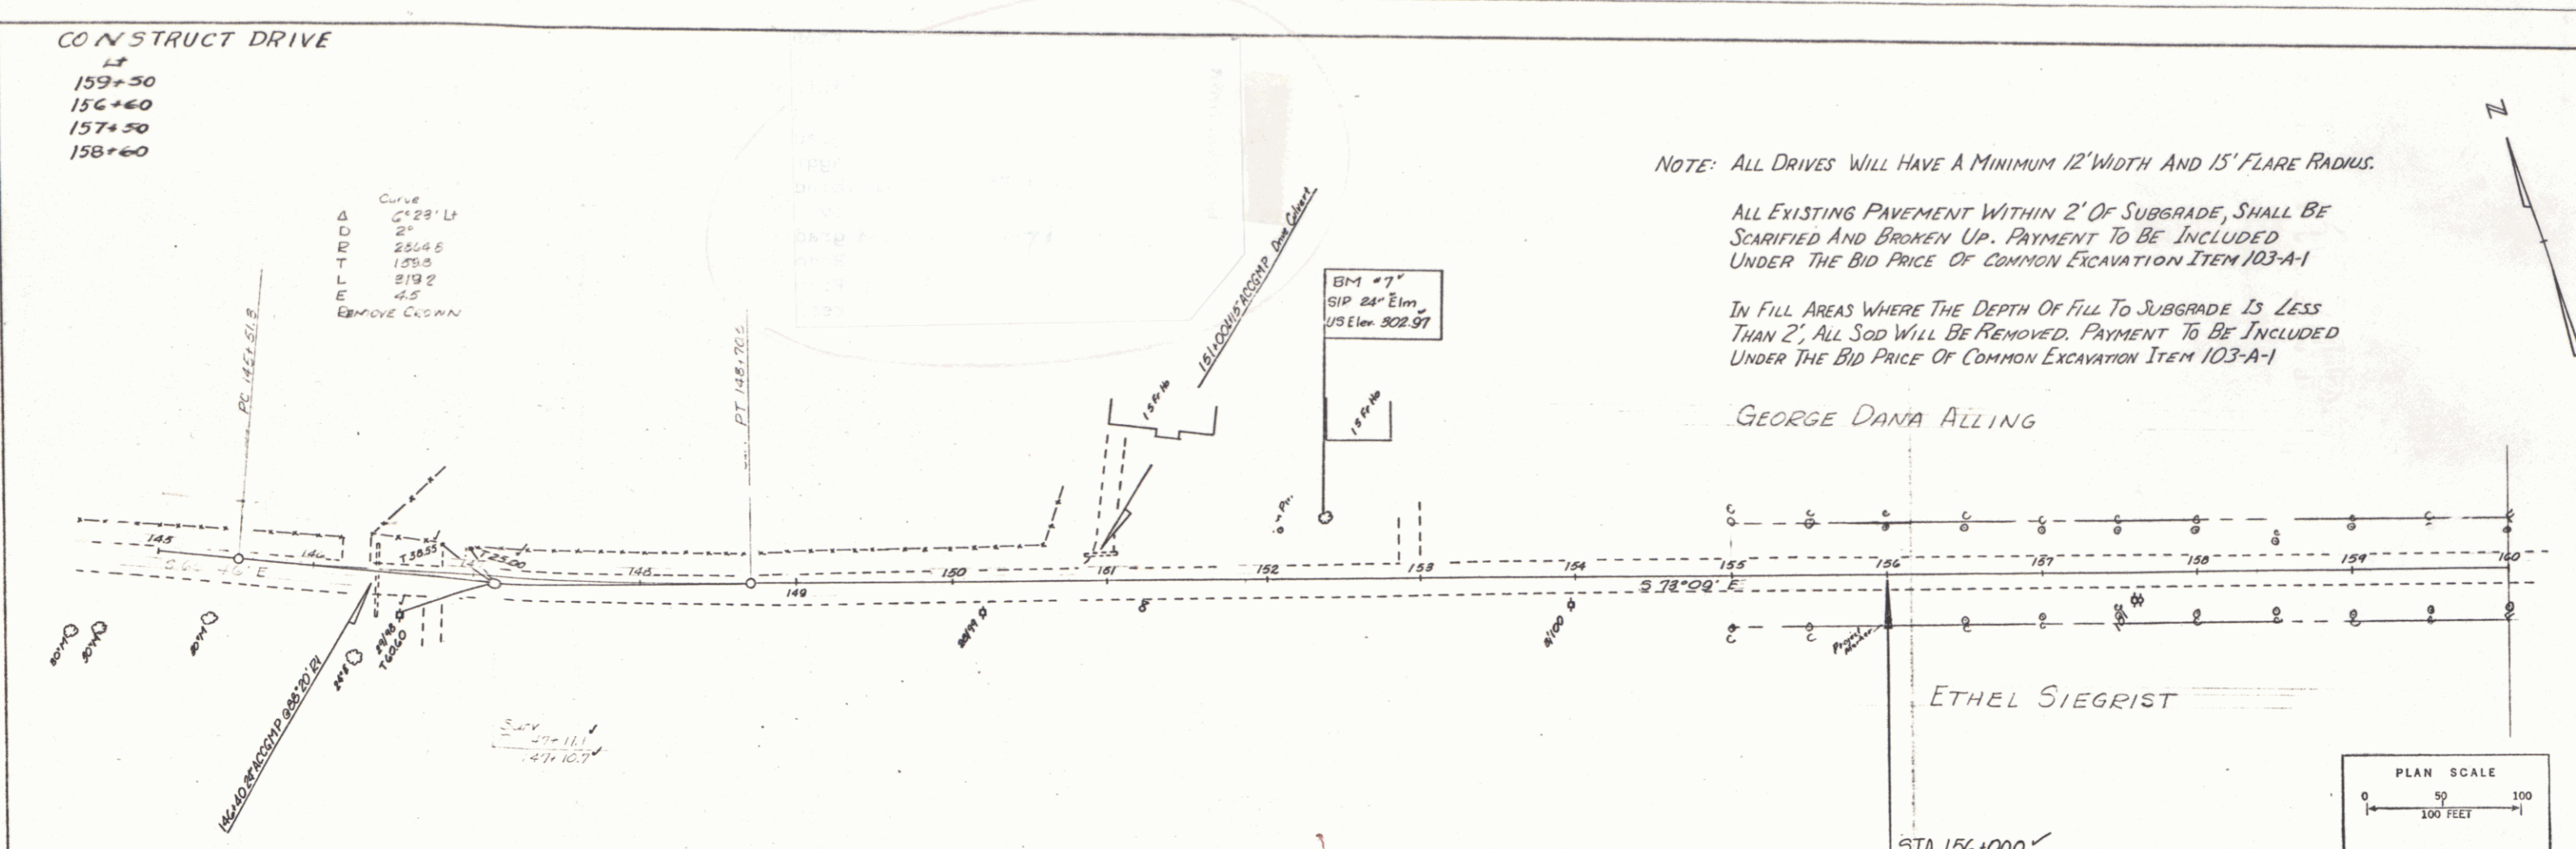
PLAN, PROFILE, G.P.R. & E. STANDARD
